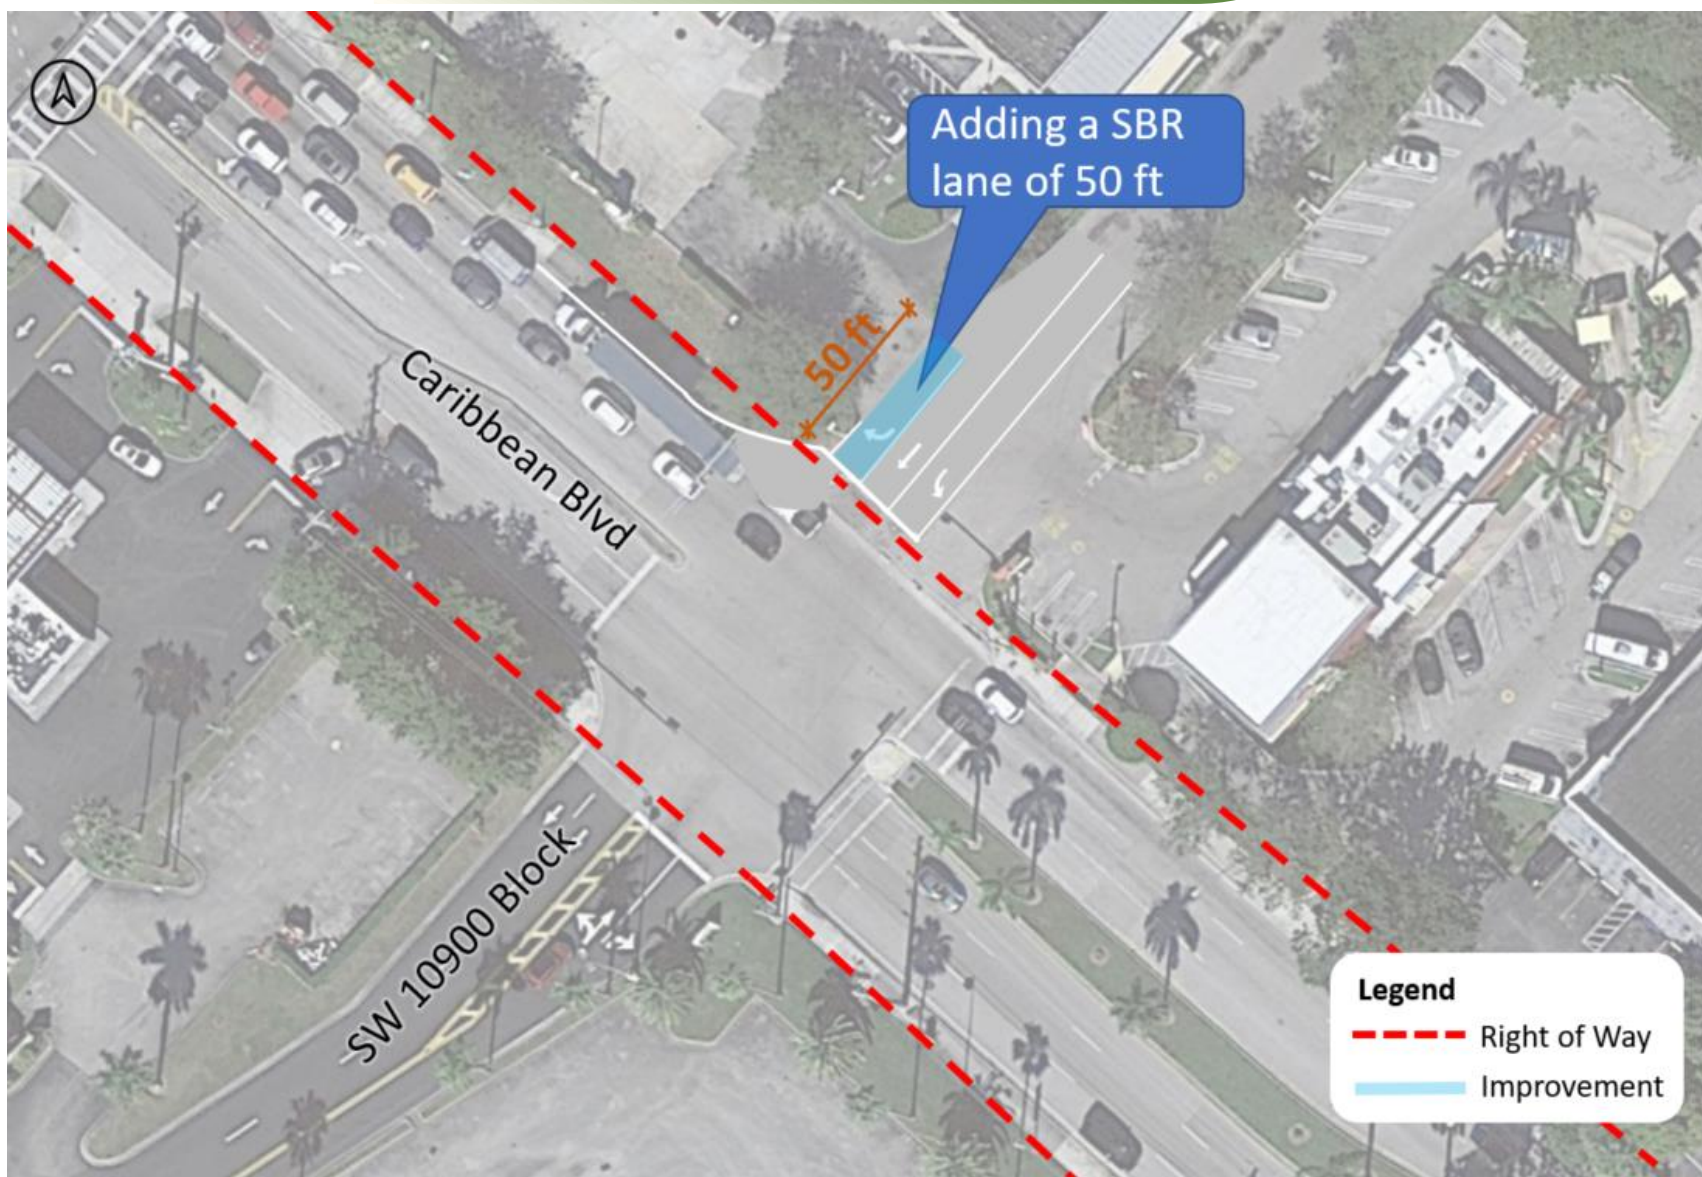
Conceptual Design Plan – SW 10900 Block and Caribbean Boulevard
